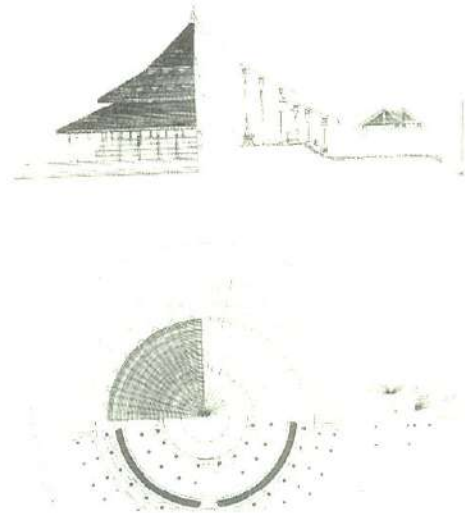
Conjectural drawing of plan, section and elevation of Watadage
